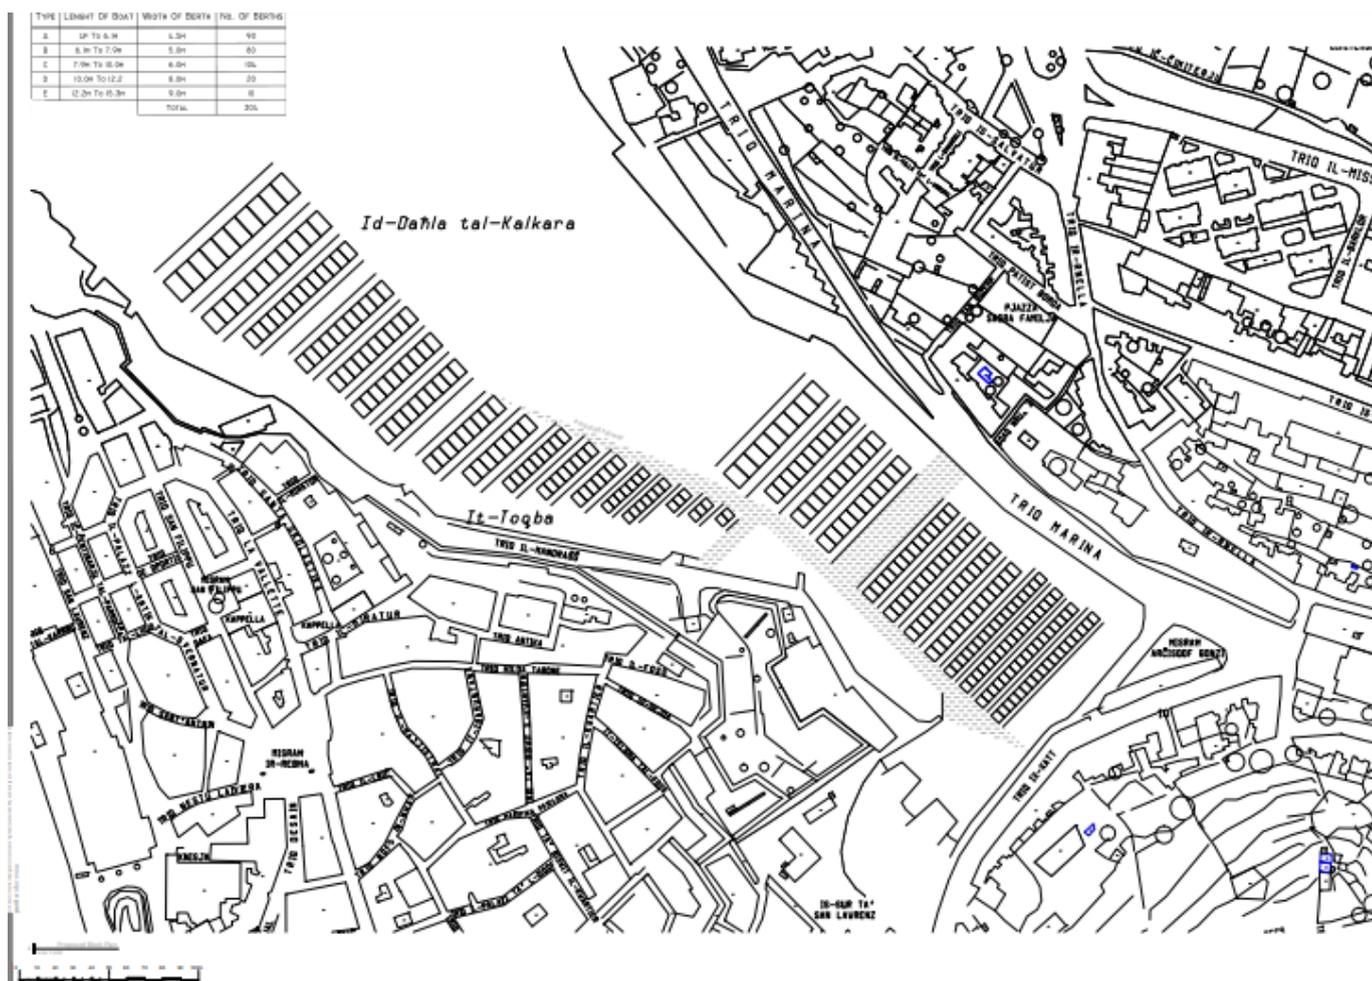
Block plan showing the proposed location of the Project (source: E-Apps)
